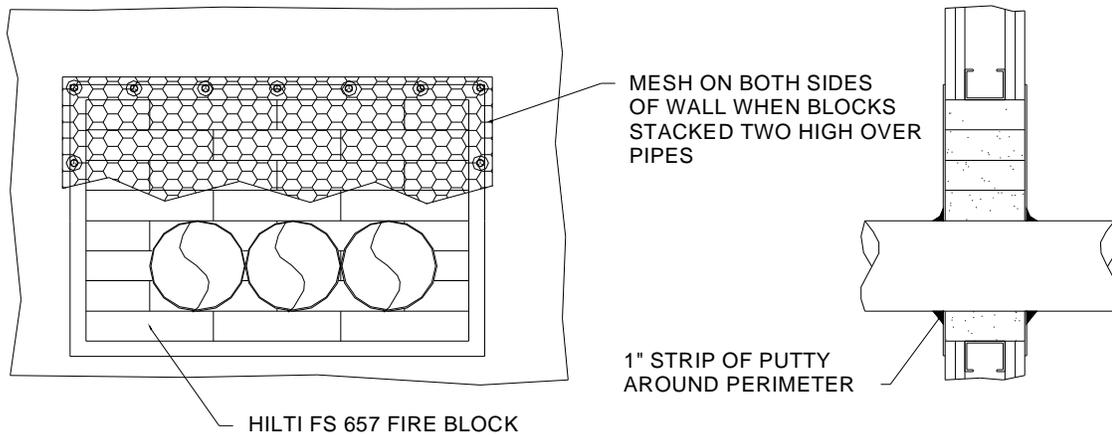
BUILDING SERVICES MULTIPLE ITEMS THROUGH WALLS
